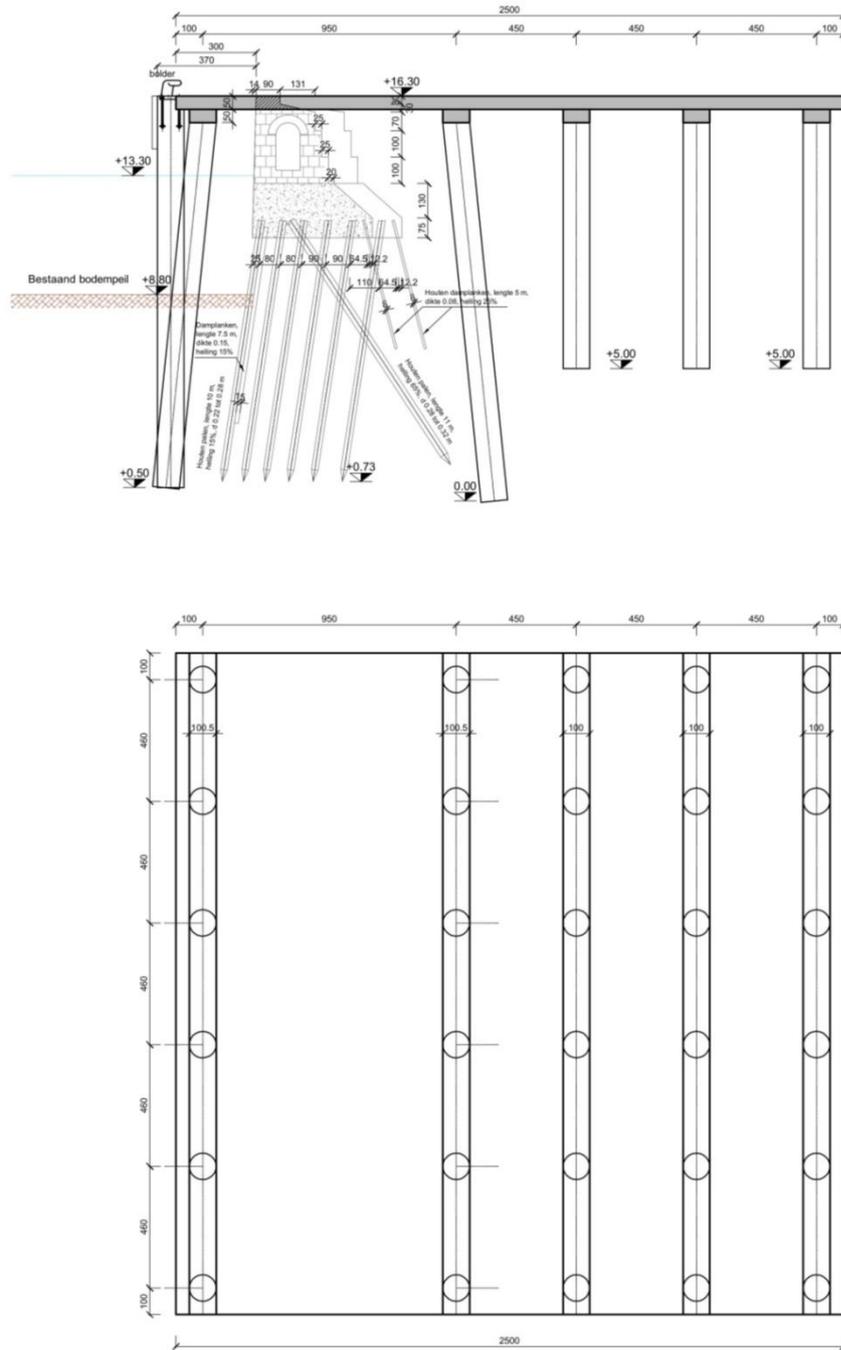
Vergote Dock – reinforced quay wall – loading/unloading area – 40 kN/m² mobile load (source: Technum)
